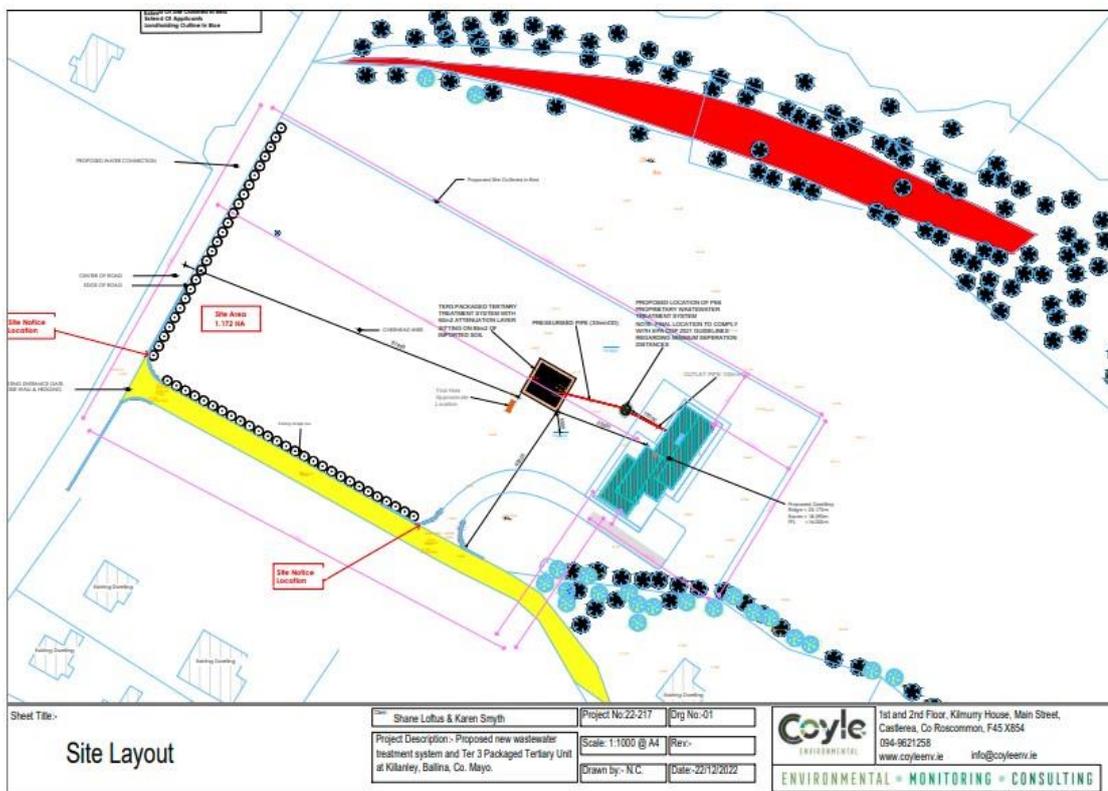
Extract from Site Plan (as Prepared by Simon Beale and Associates)
